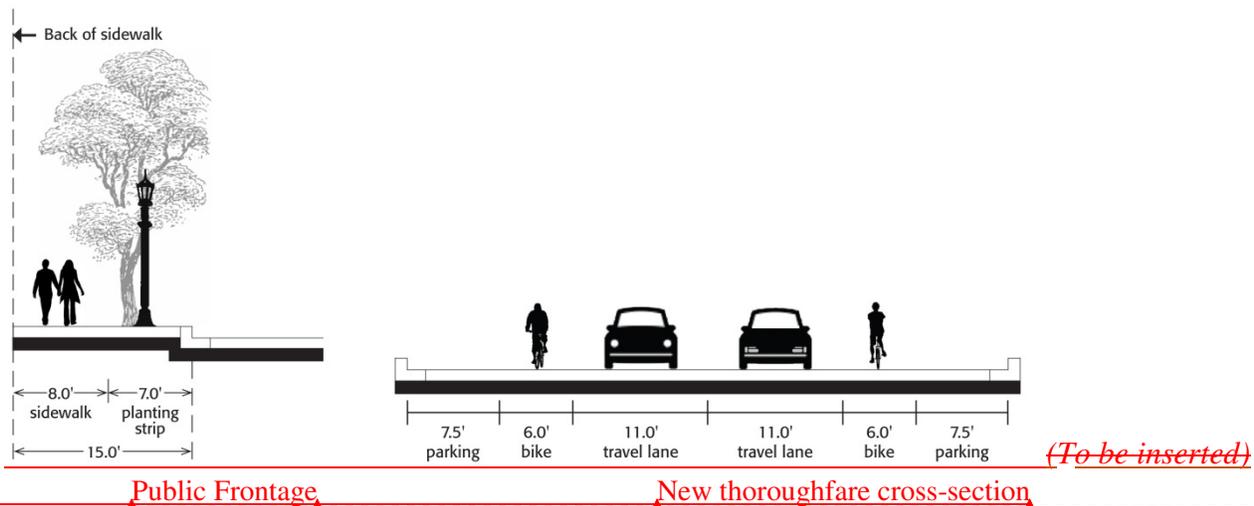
Example of Tukwila Urban Center envisioned Southcenter streetscape
